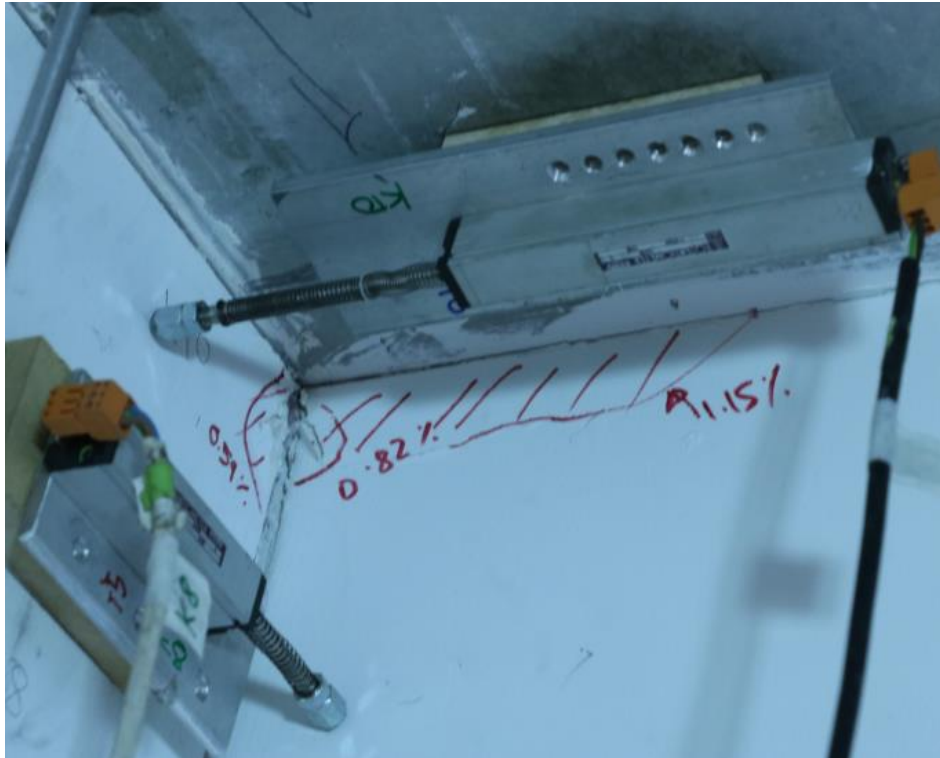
Specimen B1 – Step 11 – DS1b & 2a: Cracking of plaster along L-trim and damage to wallboard– location 10
